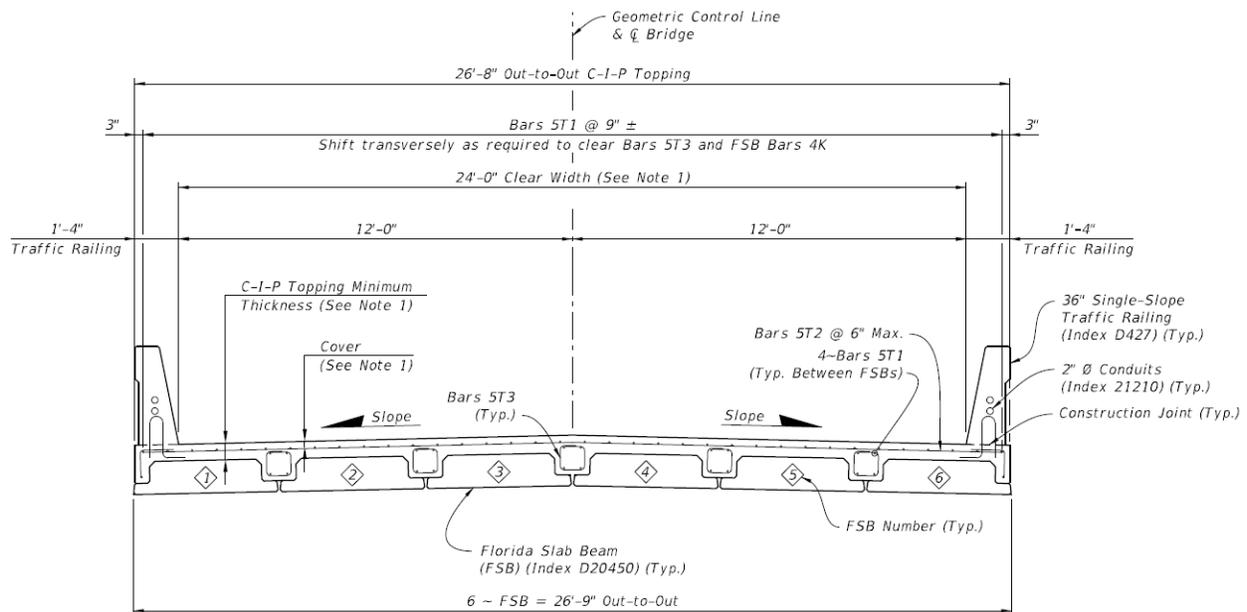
Typical section for FSB standard bridge configuration available in 12, 15, & 18-inch precast thicknesses
